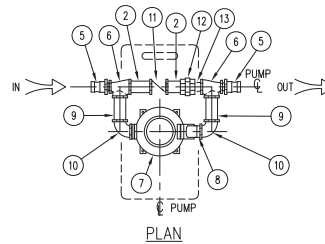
DIKE DRAIN PUMP ASSEMBLY INSTALLATION
